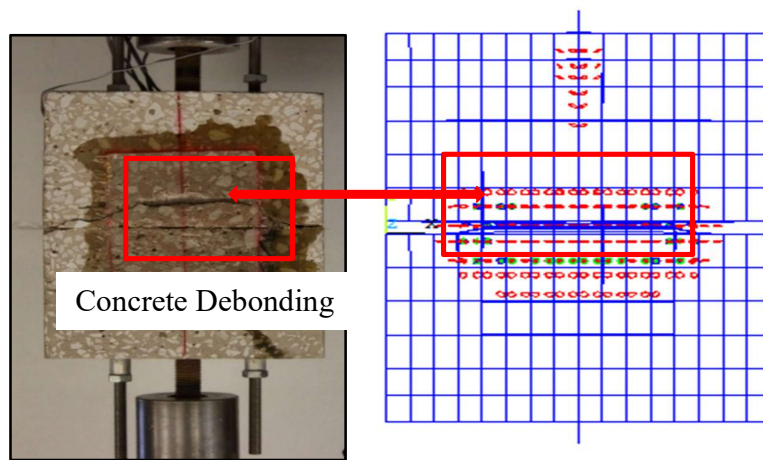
Crack patterns at the failure of BN1-1 specimen.
